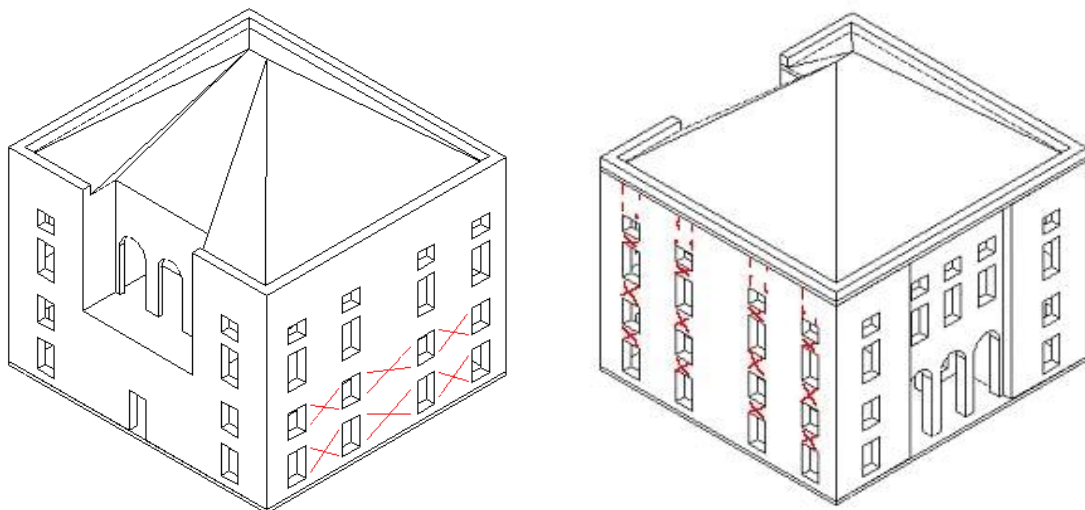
In-plane façade failure mechanisms for an unreinforced masonry building (DDPC, 2006)
